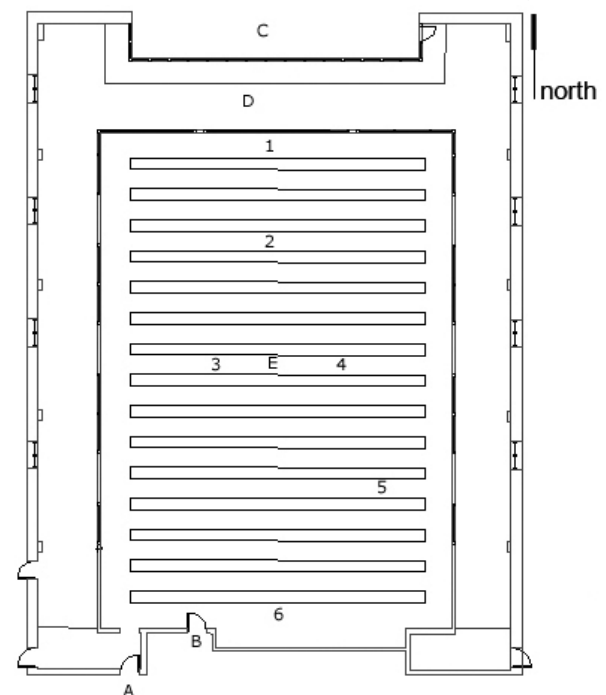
Floor plan of library stacks and gallery. 1-6 sensor locations, A - security entry, B - stairwell, C - balcony, D - reading room/gallery, E - stacks.
